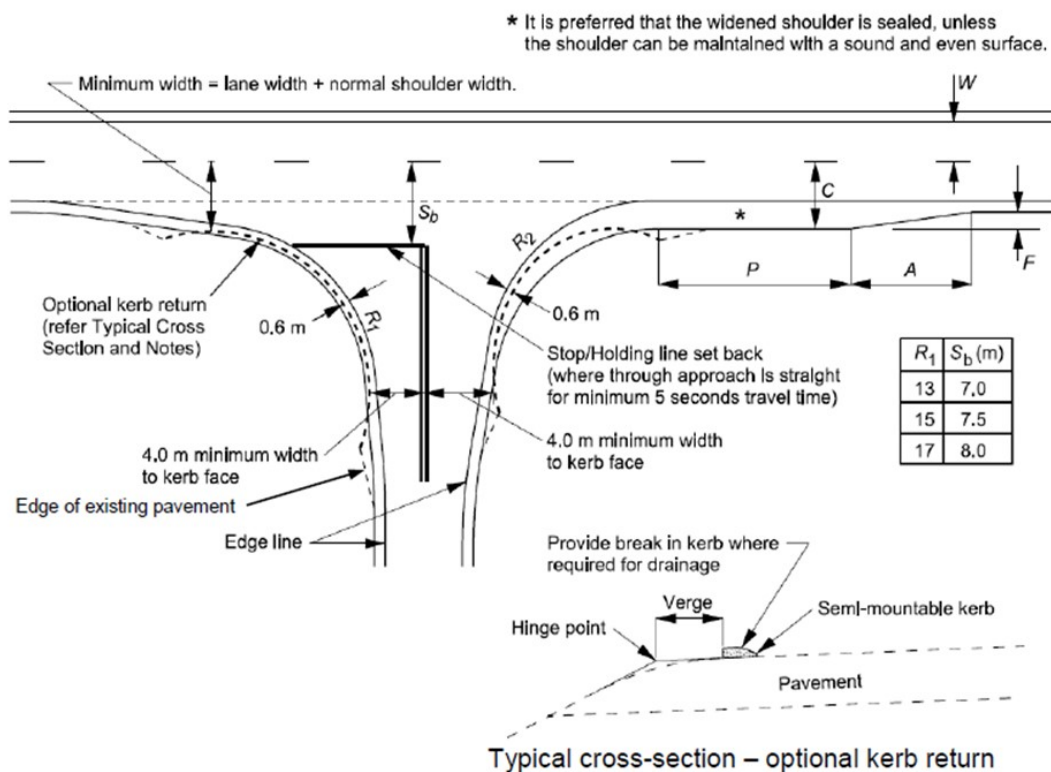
Rural BAL Treatment (Austroads Guide to Road Design)
